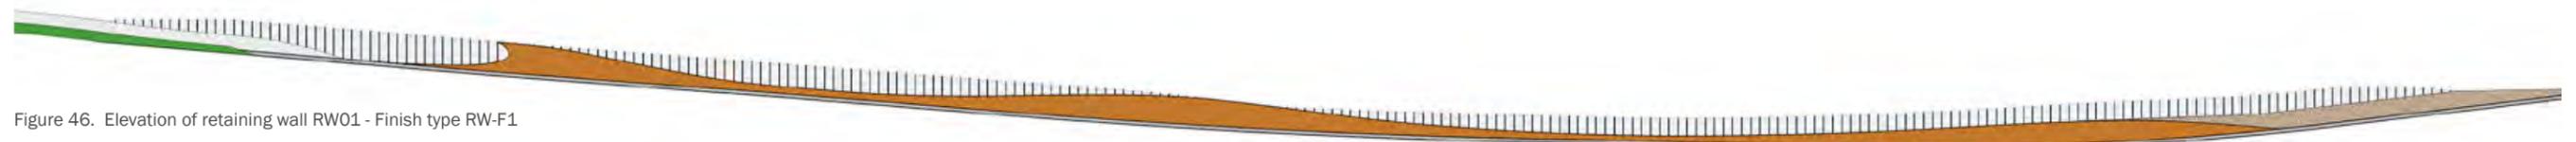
Elevation of retaining wall RW01 - Finish type RW-F1
